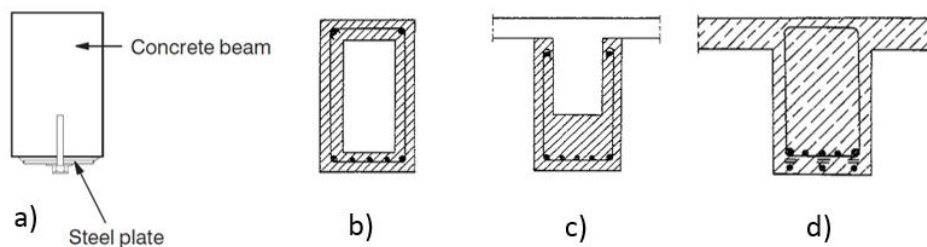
Example of concrete beams strengthened using conventional methods, a) with steel plate, b) and c) with additional reinforcement covered with new concrete and d) with near-surface-mounted reinforcement [19].
